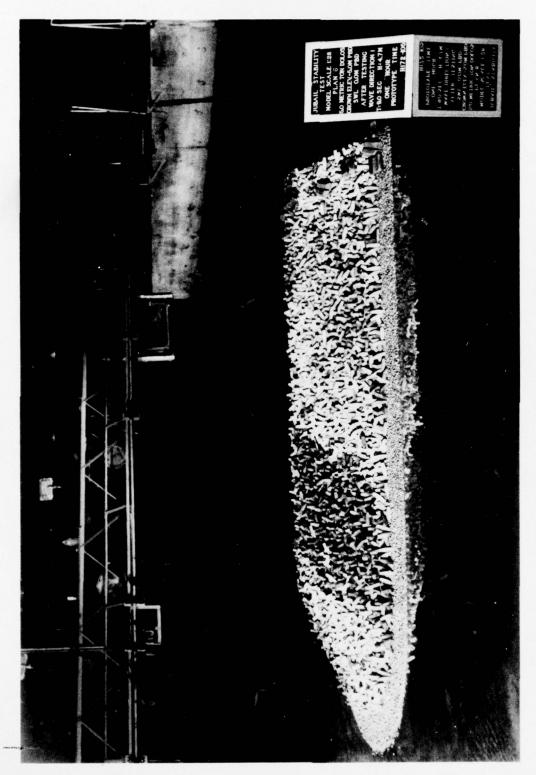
Seaside view of Plan 6 after attack of 9-sec, 4.7-m waves from wave direction 1
